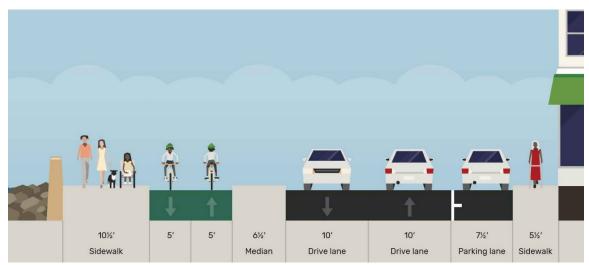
Typical Option 1 Cross Section – Two-Way Protected Bike Lane, <u>East Side</u>
